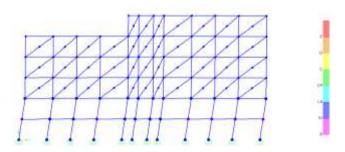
Load Resisting Mechanism for a typical frame of Building with Infill panels
